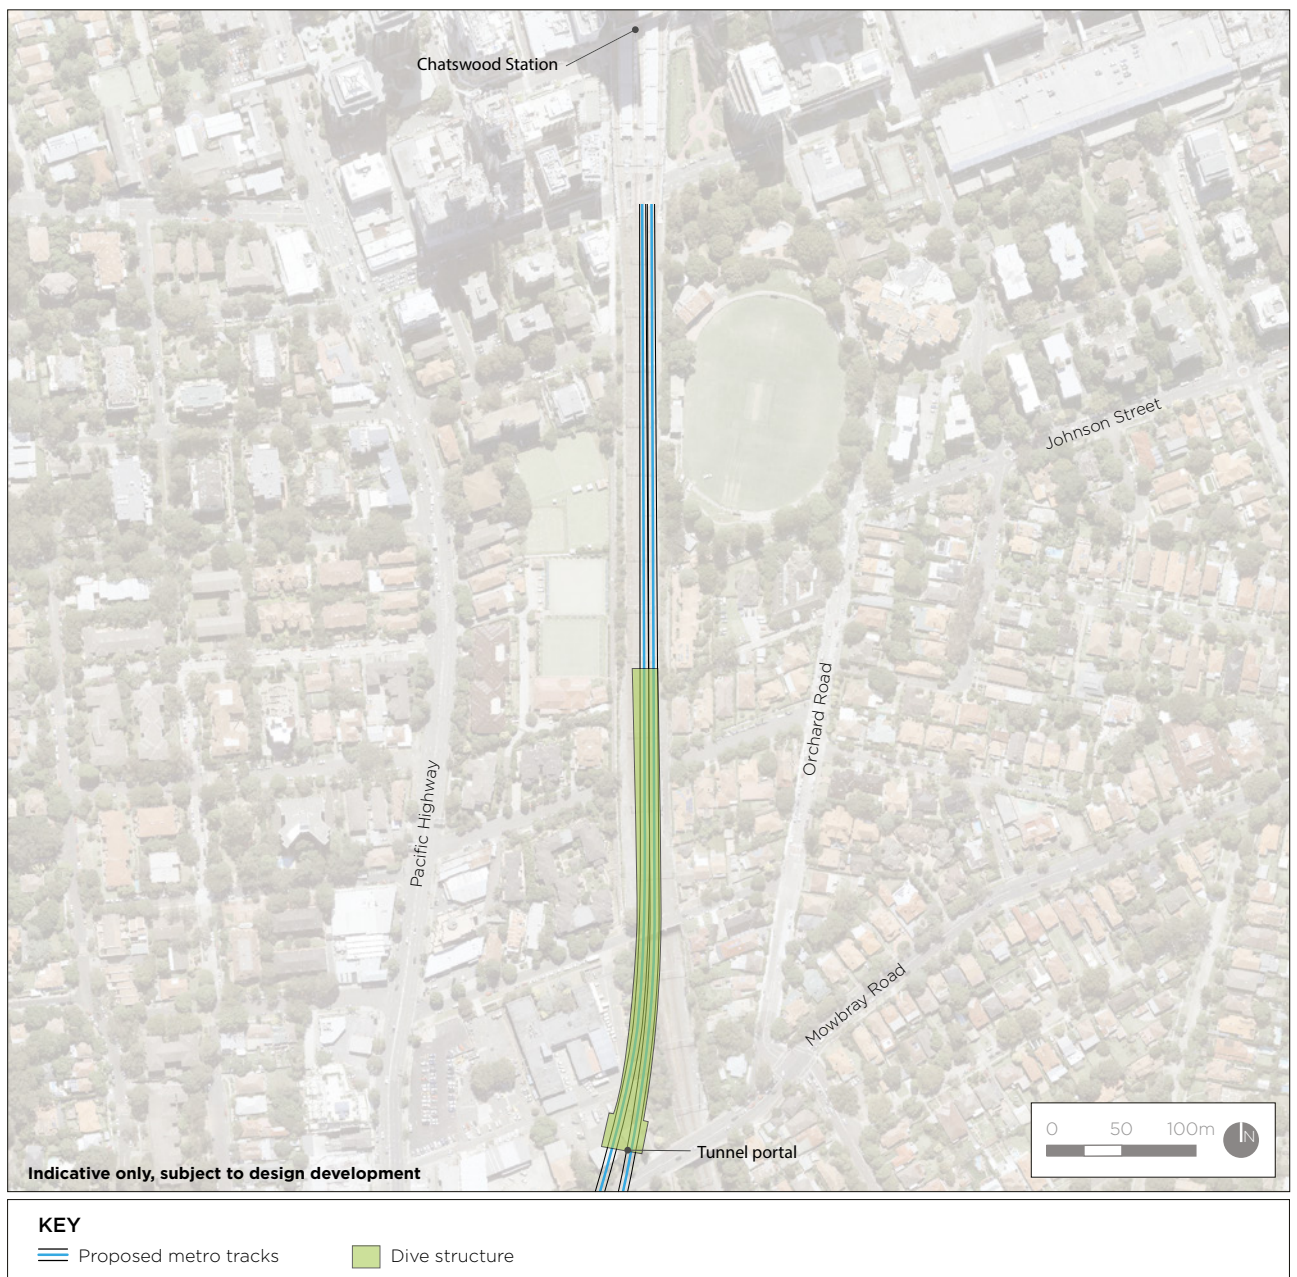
Chatswood dive structure and tunnel portal – indicative plan view
